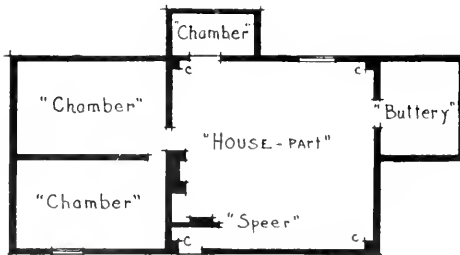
PLAN OF HOUSE AT WESTWARD, NORTH MEOLS
